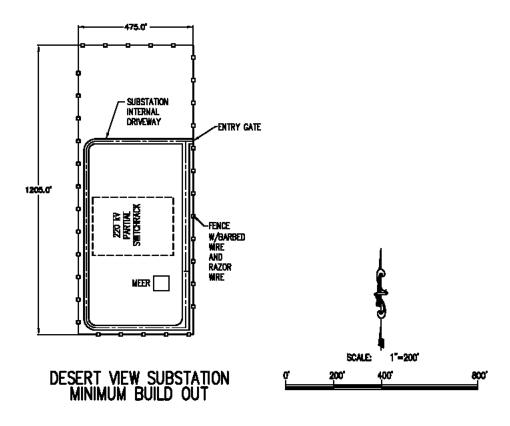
A-d Proposed Desert View Substation Layout for Minimum Build Out
